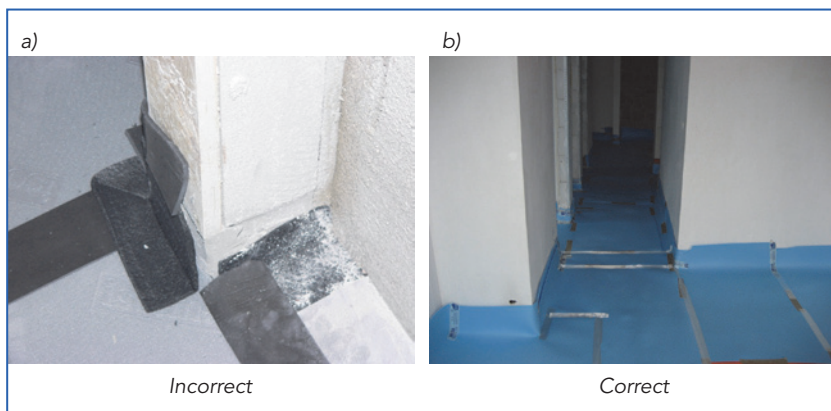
a) Example of a bad installation of flanking strips of a floating floor. Perimeter resilient strips are not continuous in corners, too short and not properly fixed to the walls. This can result in connections between the screed and the surrounding walls, which will decrease sound insulation performance. b) Example of good installation of resilient layer prior to pouring a screed. As seen, the impact insulation layer is continuous; corners are covered with the resilient layer, which is long enough to be over the screed level after pouring the mortar.
